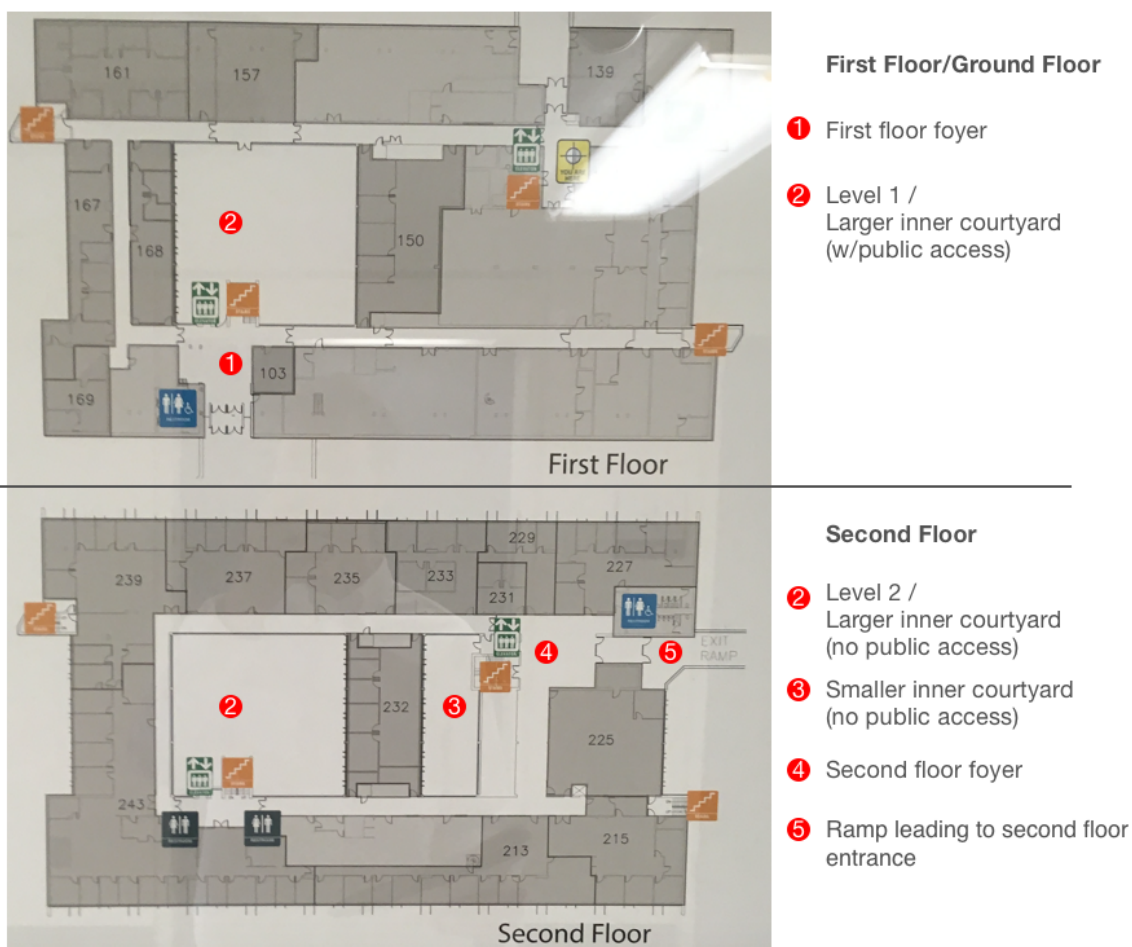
Whitmore Hall First and Second Floor Plans *Edited*—showing referenced spaces¹⁰
